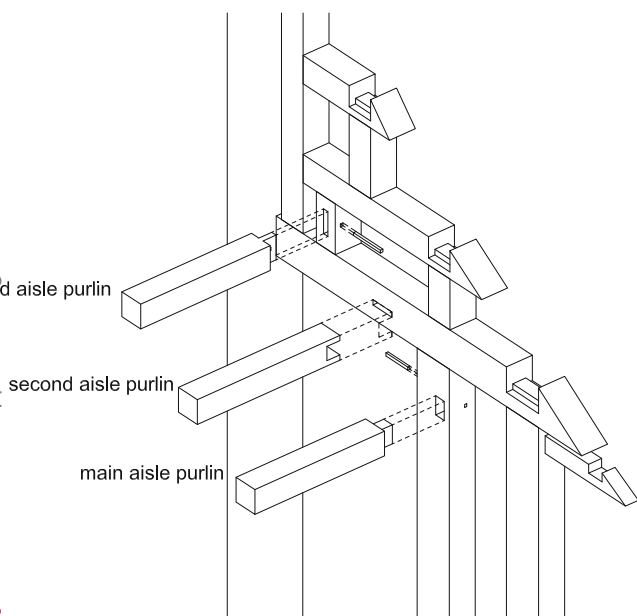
Purlins from the first bay meeting the second transverse frame in aisle roof
